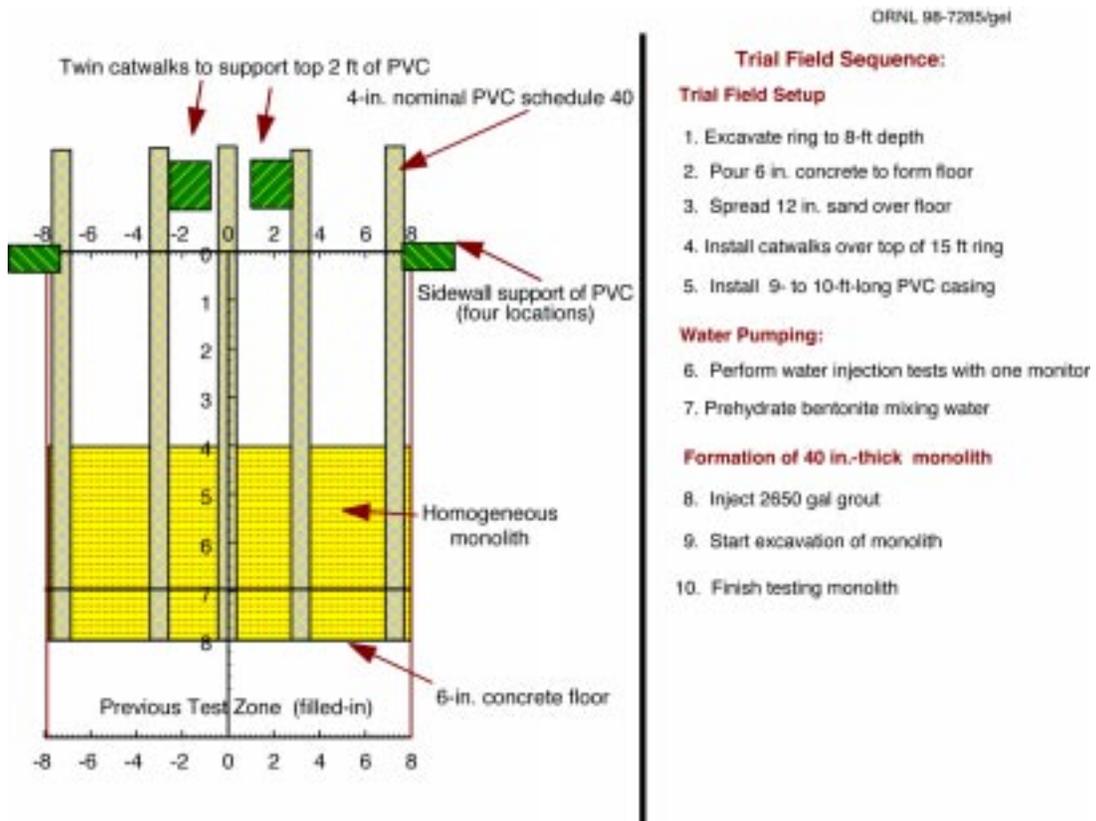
Elevation view of 15-ft-diameter steel ring, used in the cold field demonstration at the Halliburton test facilities.
